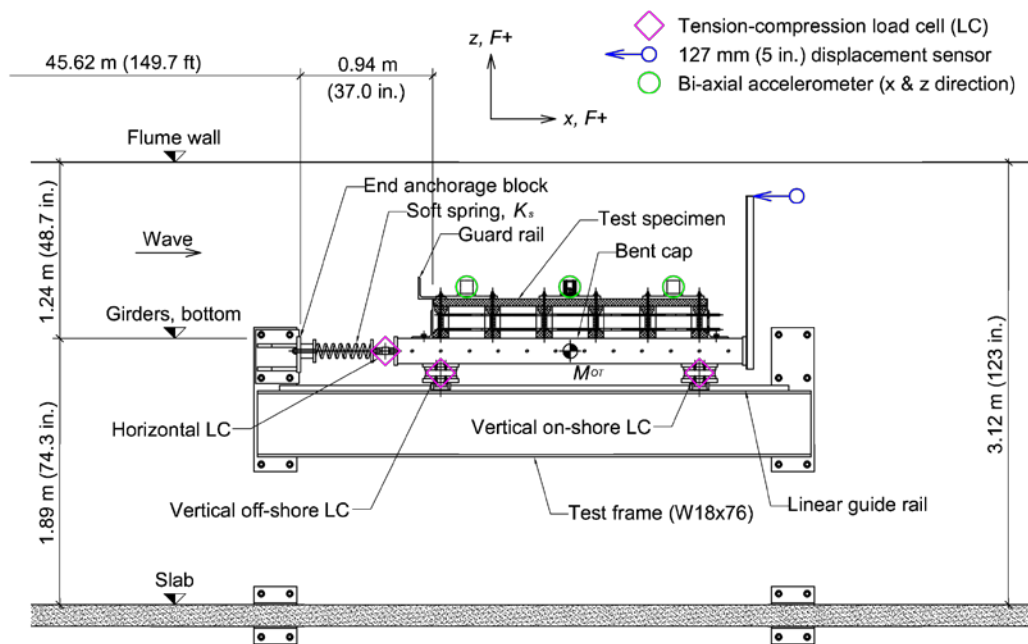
ELEVATION VIEW OF TEST SPECIMEN (FLEXIBLE SPRING SHOWN).
